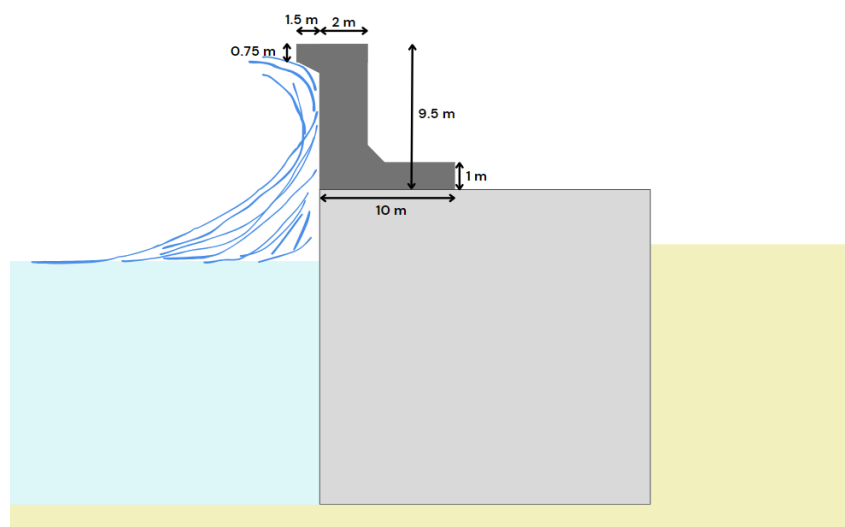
Schematic view of the wave return wall on top of the caisson unit.
